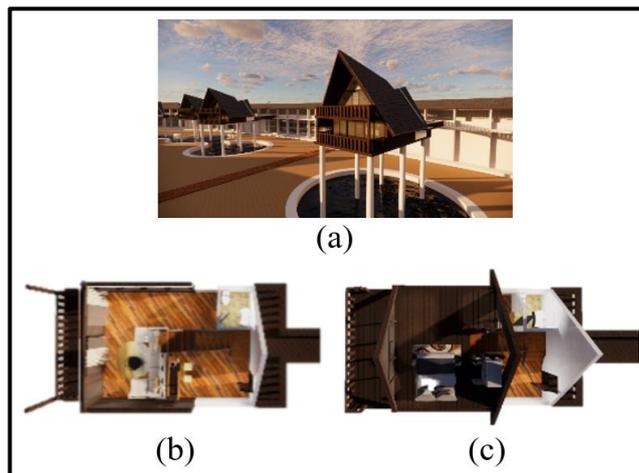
(a) Perspektive of Standart room; (b) Floorplan Standart Room 1; (c) Floorplan Standart Room 2
